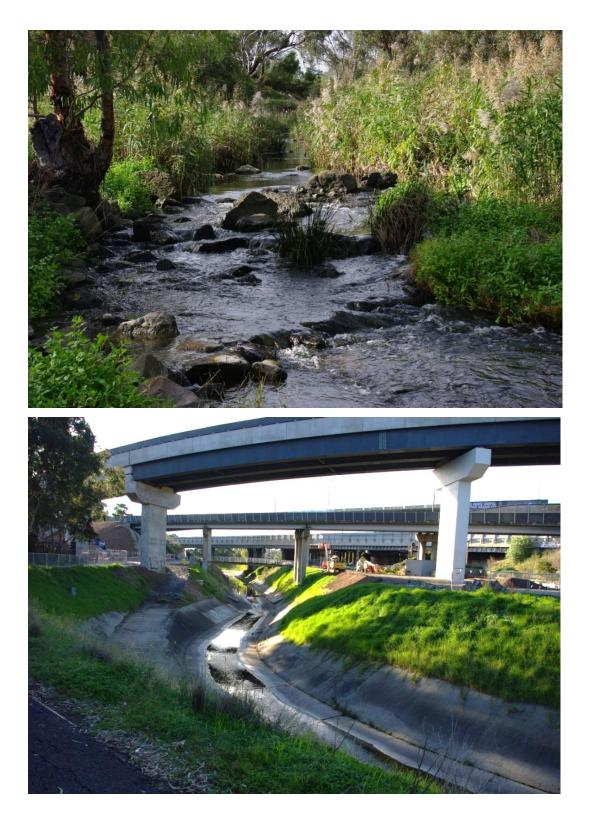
Engineered waterscapes of the naturalised Merri and entirely constructed Moonee Ponds Creeks. Source: Author photo (2017).
